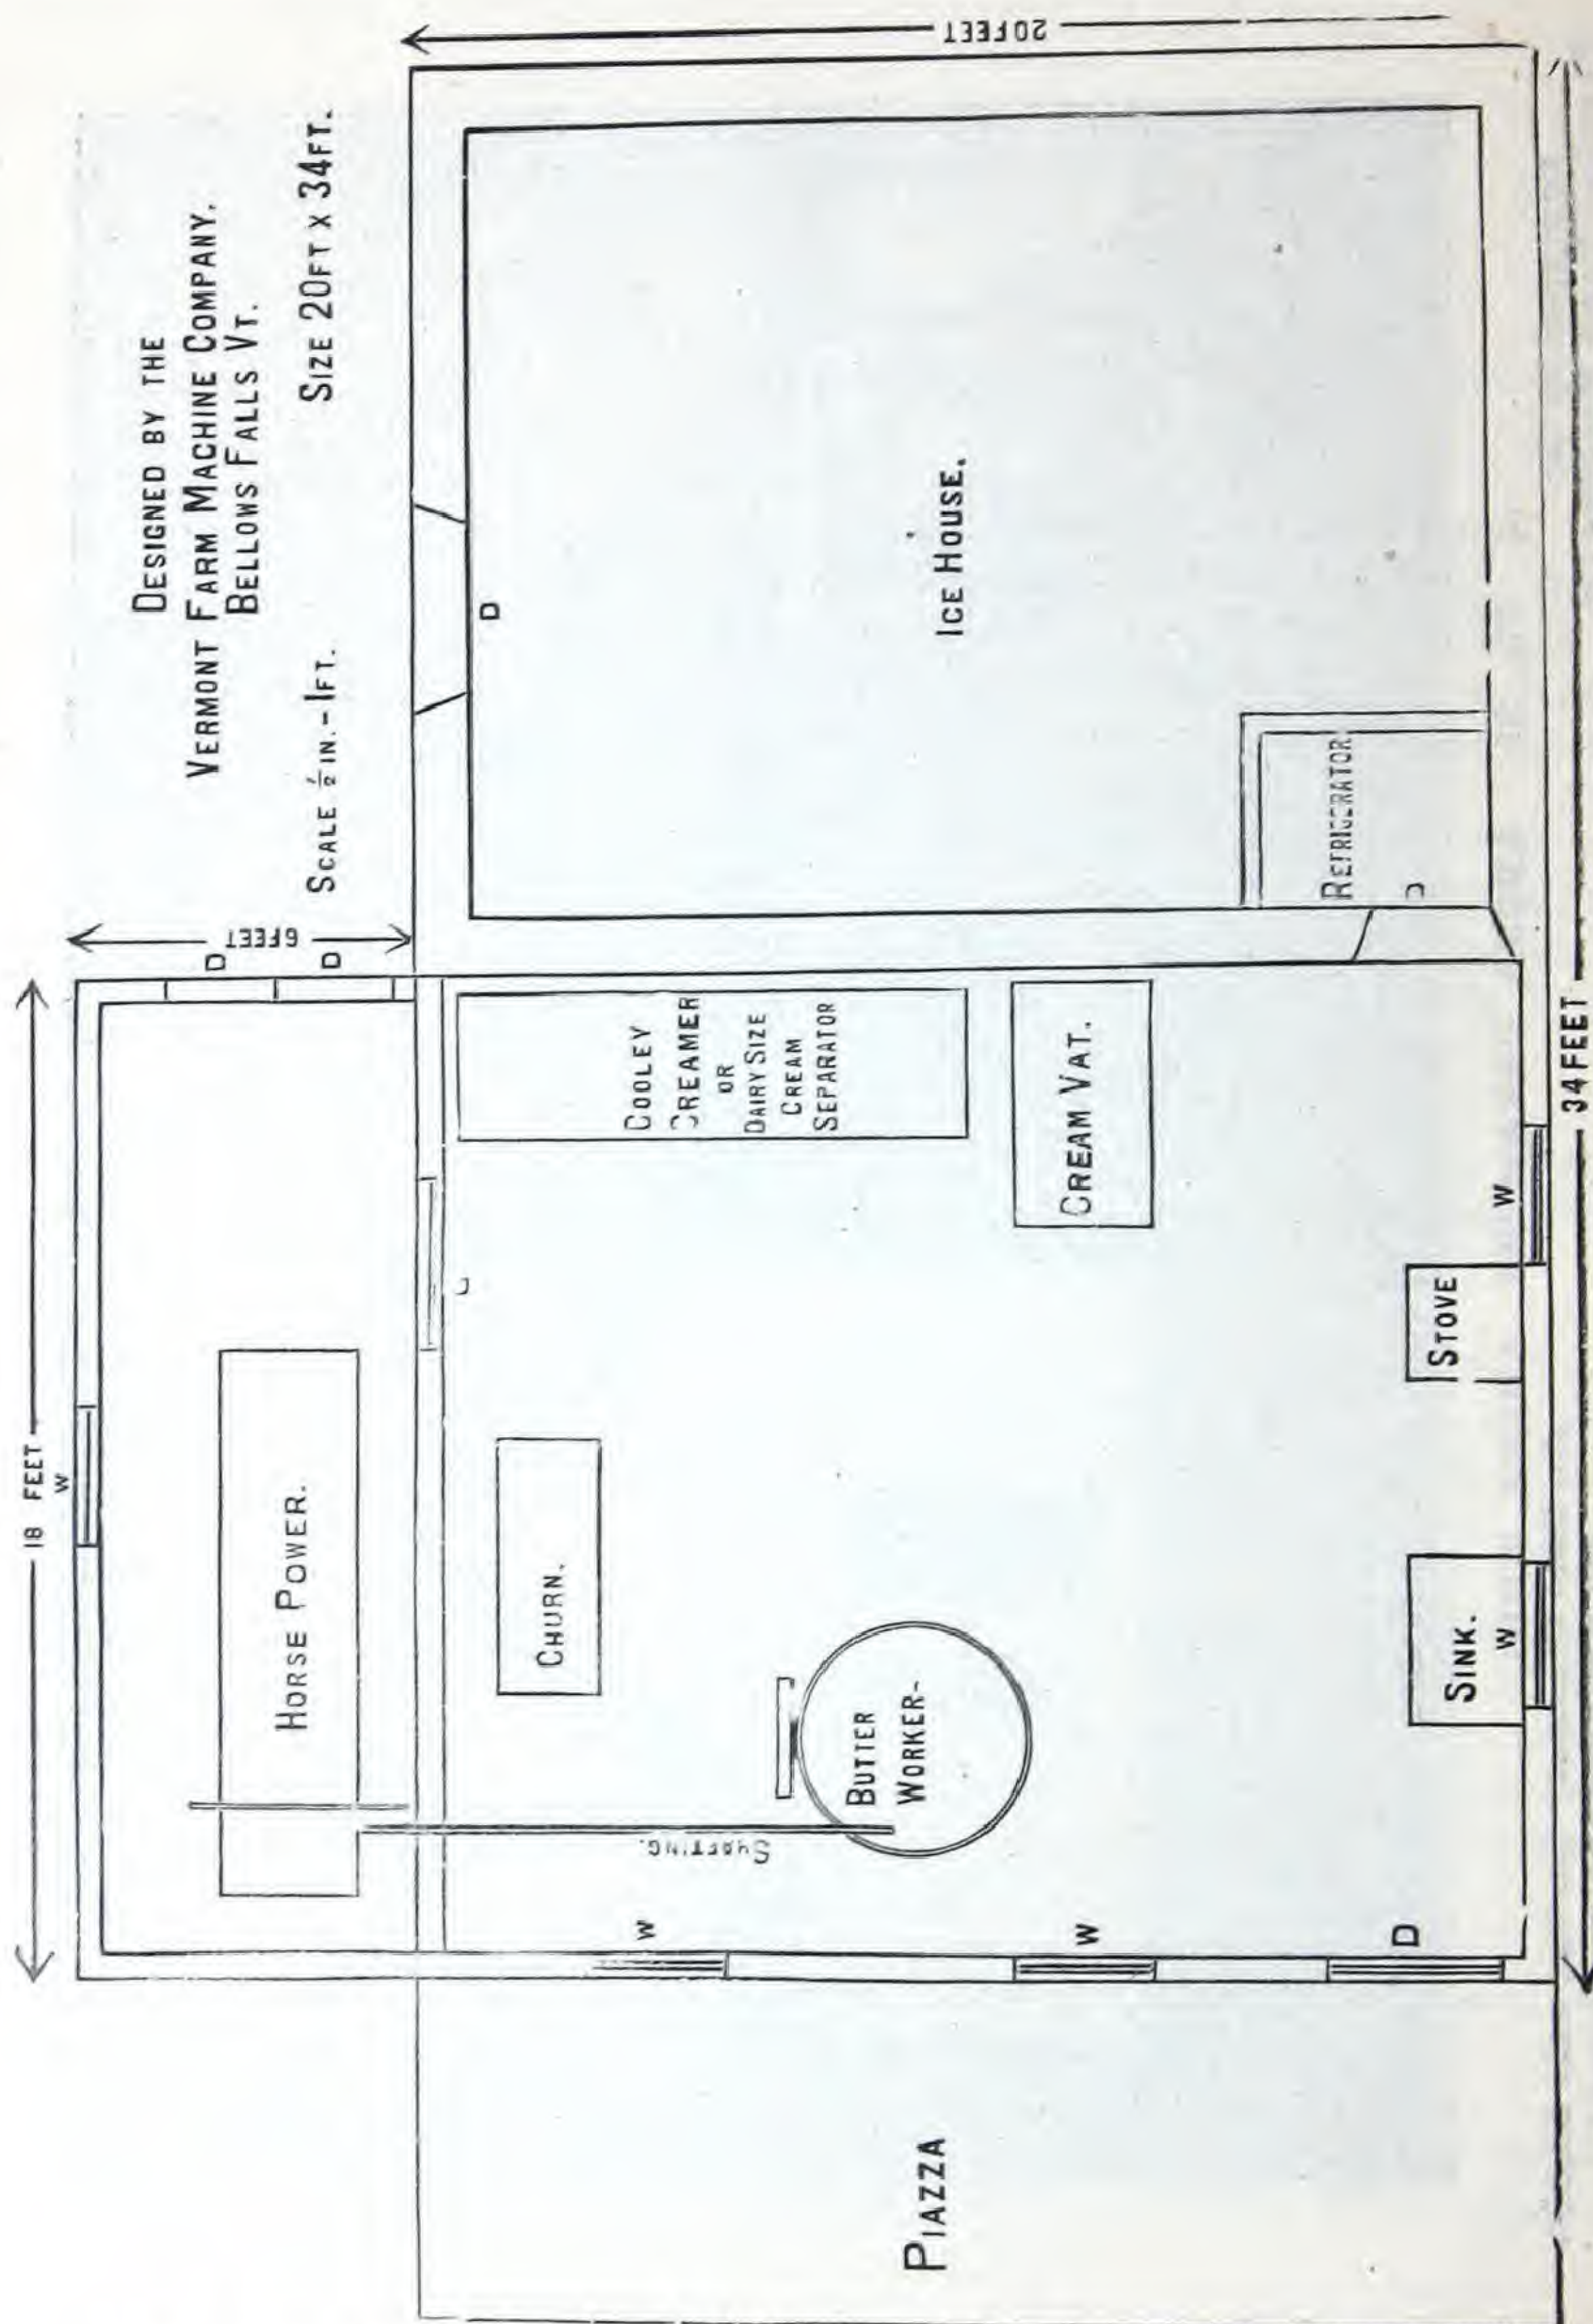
GROUND PLAN OF A MODEL DAIRY BUILDING.
